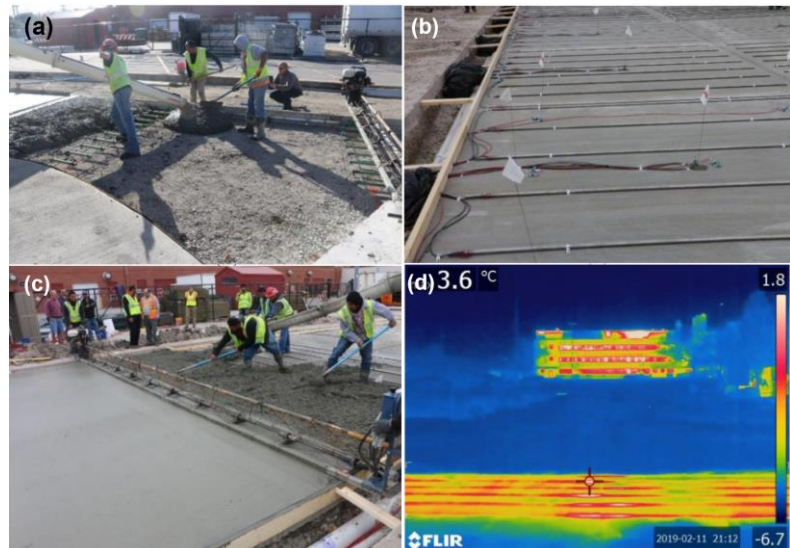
Self-heating electrically conductive concrete slabs constructed at the Iowa DOT headquarters, as reported in [1]: (a) Slab placement. (b) Installing stainless-steel electrodes and wiring. (c) Placing and compacting conductive concrete layer. (d) Infrared thermography showing self-heating performance.
